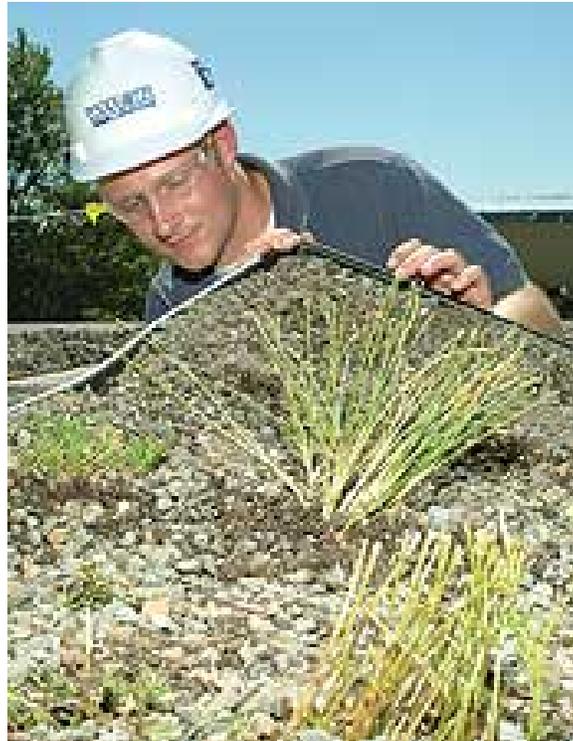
Installation of a green roof on the Headquarters Building at Tobyhanna Army Depot, PA (photo by Steve Grzedzinski).
